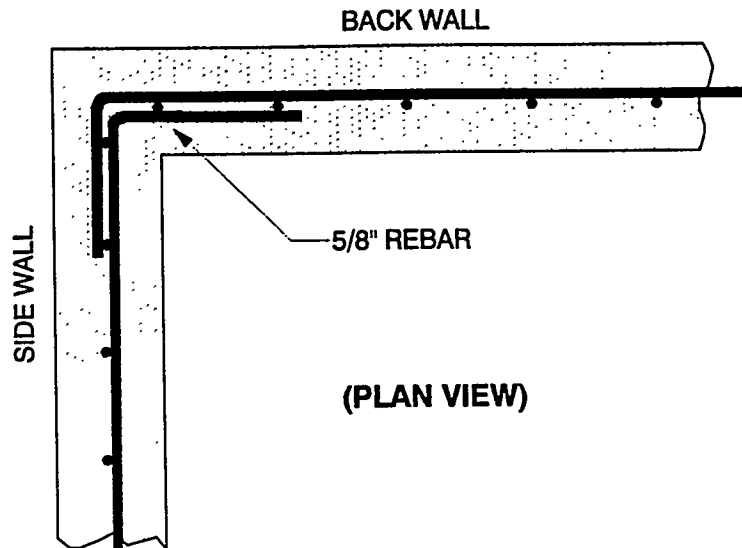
Details of concrete rebar connections at corners of the structure. In the "good" side, the connections were welded; in the "bad" side, the rebar was insulated by an epoxy coating and secured by nylon cable ties.
